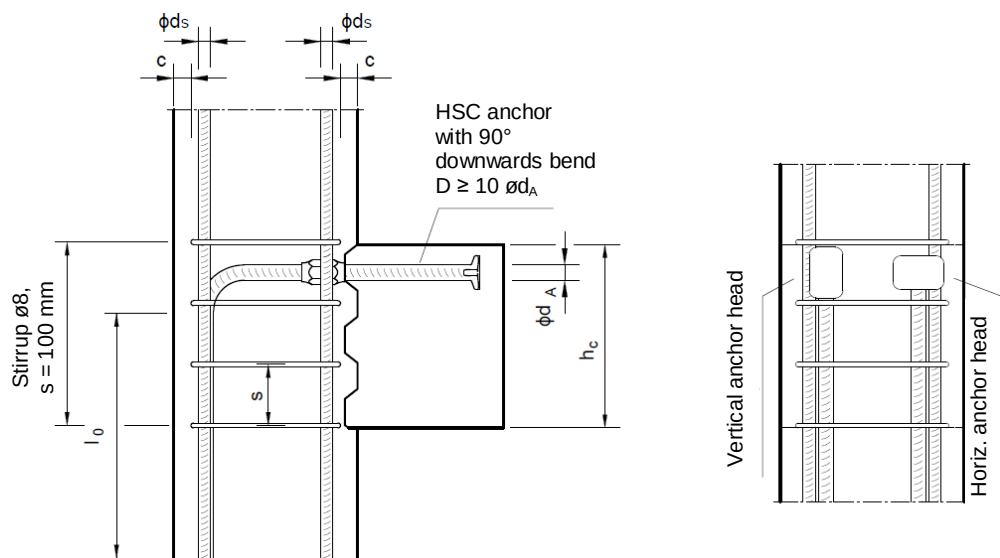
Reinforcement in the column for HSC anchors bent 90° downwards, example
